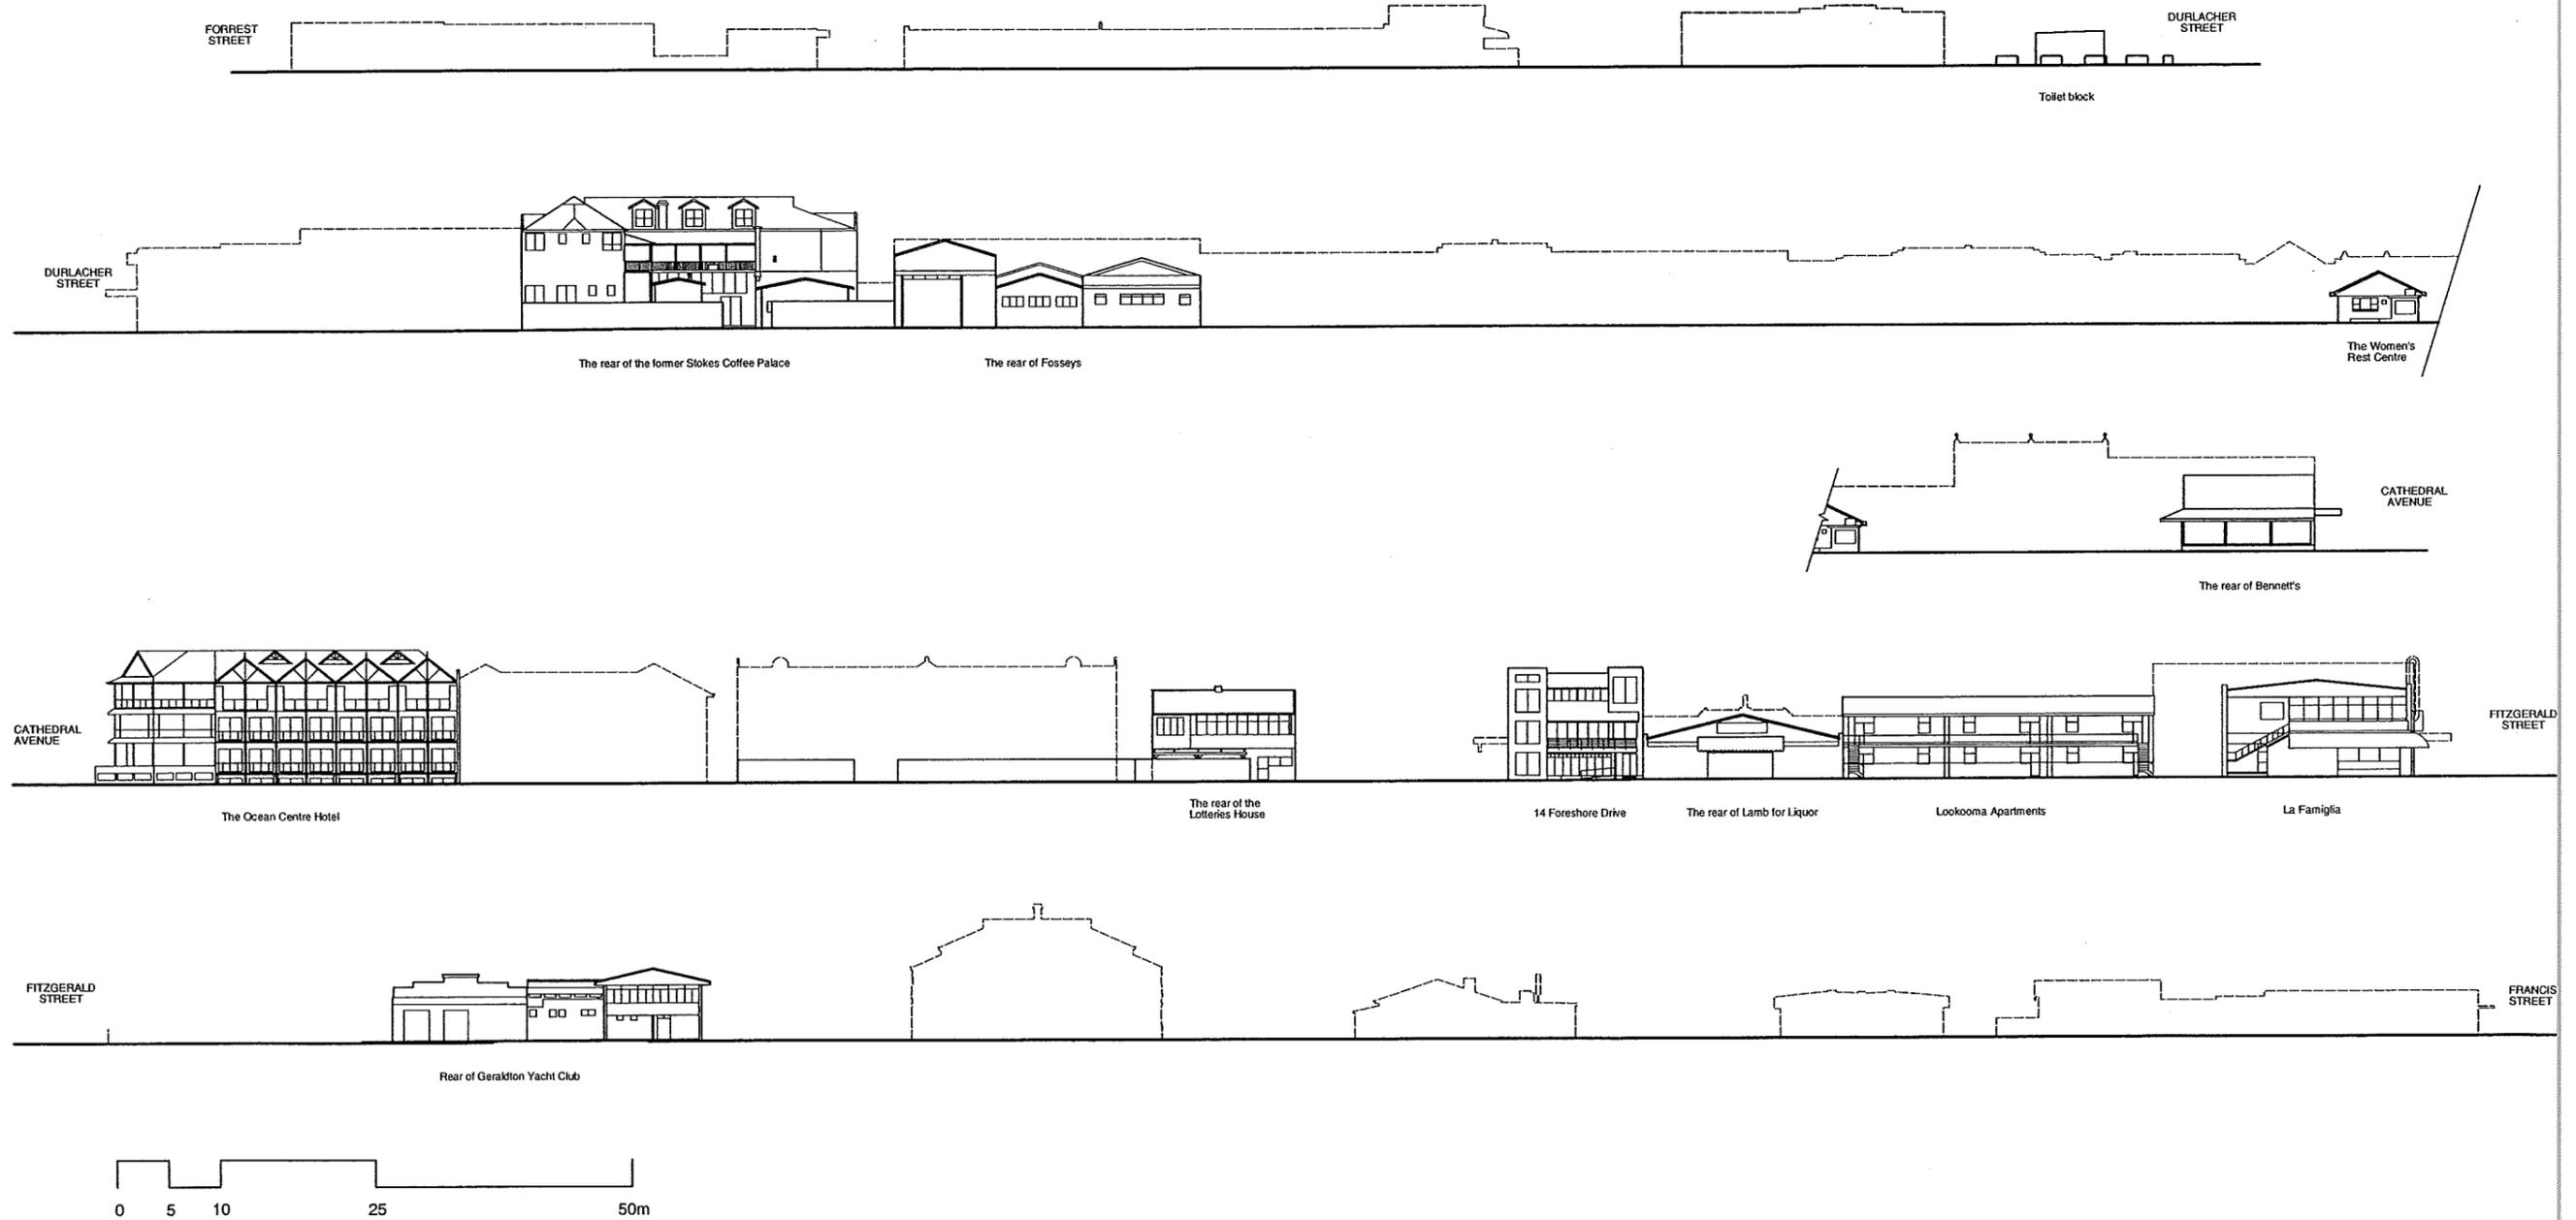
Foreshore Drive Street Elevation. Considine and Griffiths Architects. August 2002.
